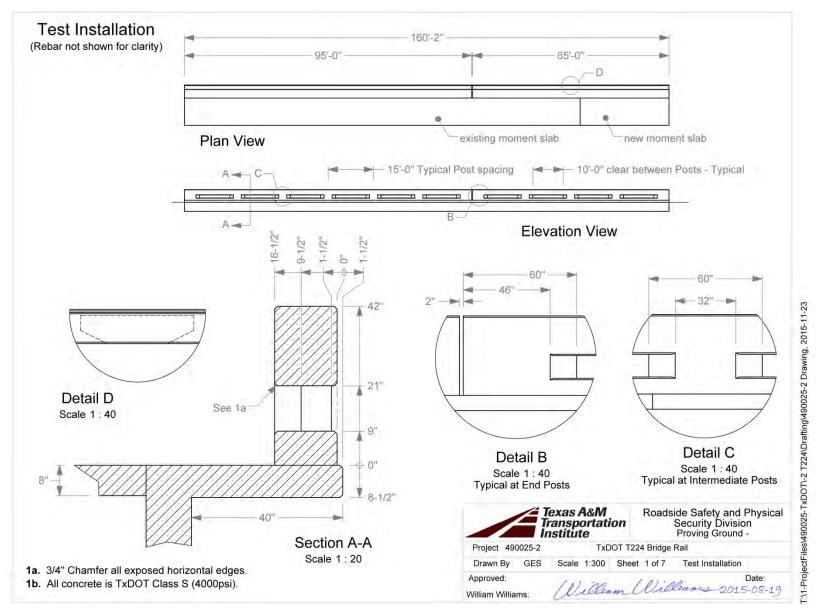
Overall Details of the TxDOT T224 Bridge Rail.
